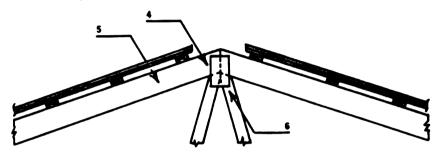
Location of test sites, Barn C. Truss No. 2, 30.8m (101'-4") from East End. West elevation. Raised ridge cap not shown.
